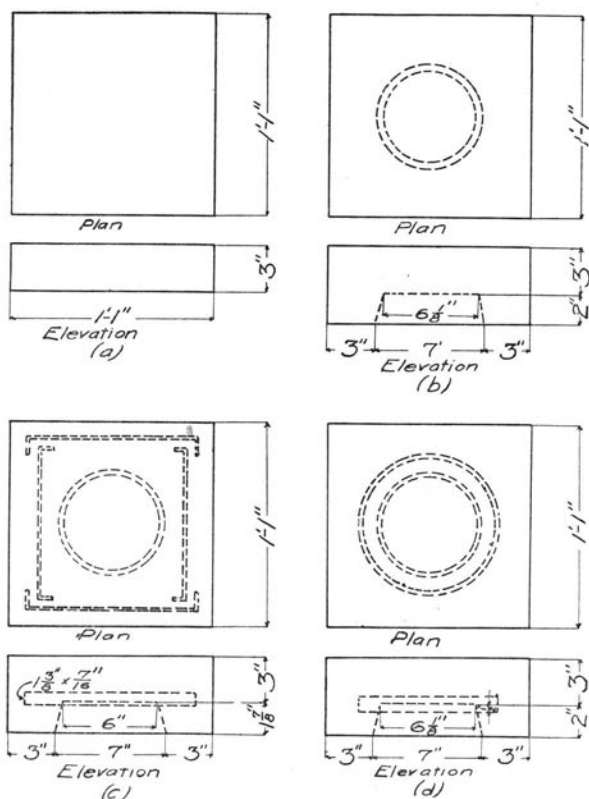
FORMS OF SHEAR TEST PIECE. (a) PLAIN CONCRETE PLATE. (b) RECESSED BLOCK. (c) and (d) REINFORCED RECESSED BLOCKS.
